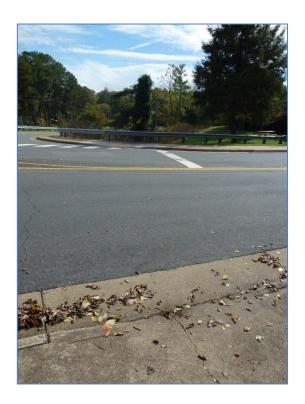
Gentry Lane, south leg of Gentry Lane Route 250 Bypass entrance intersection, looking south. Although there are curb ramps on both sidewalks, there is no crosswalk crossing Gentry Lane.
